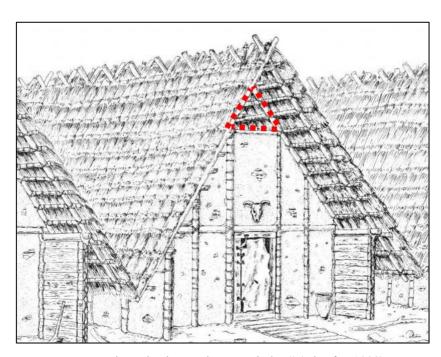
The Robenhausen house "window" (Altorfer, 1999).
